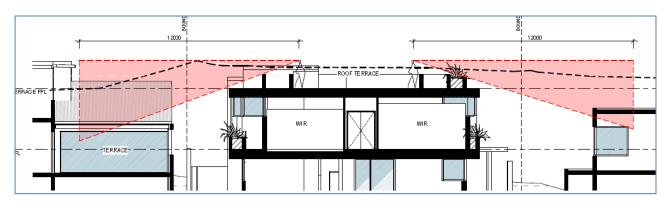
Sightline diagrams showing the overlooking from the proposed roof terrace towards the adjoining properties at 55 and 55 Wentworth Road
